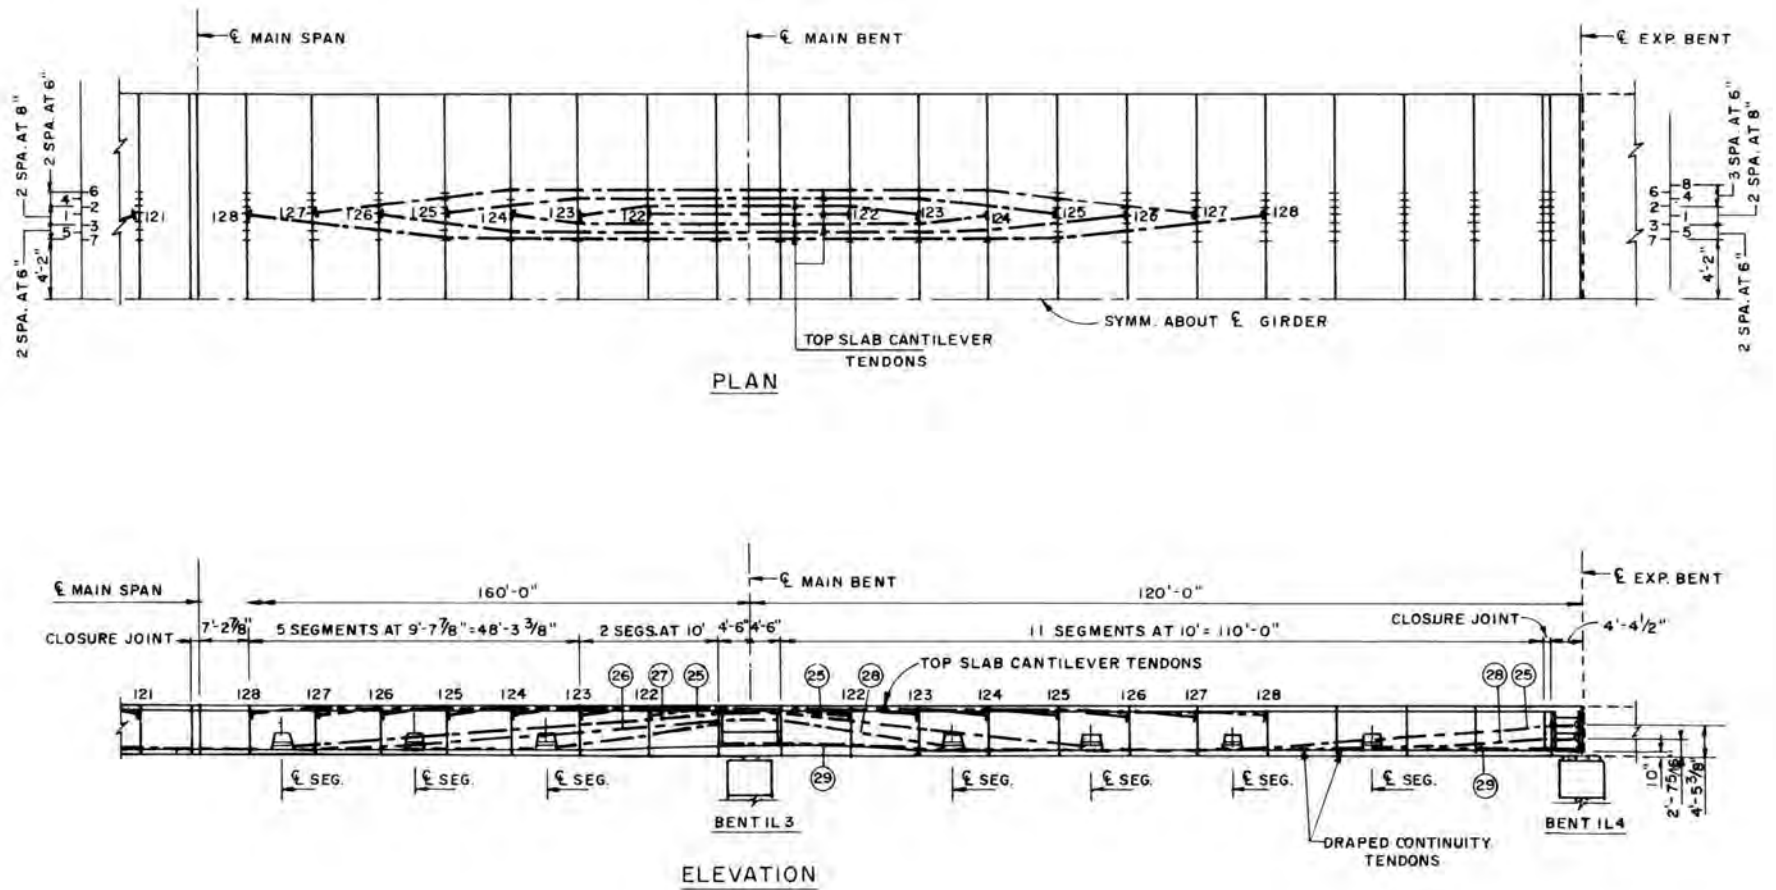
Plan and elevation of typical post-tensioning layout for 160 ft (48.8 m) cantilever span over four-lane highway.
